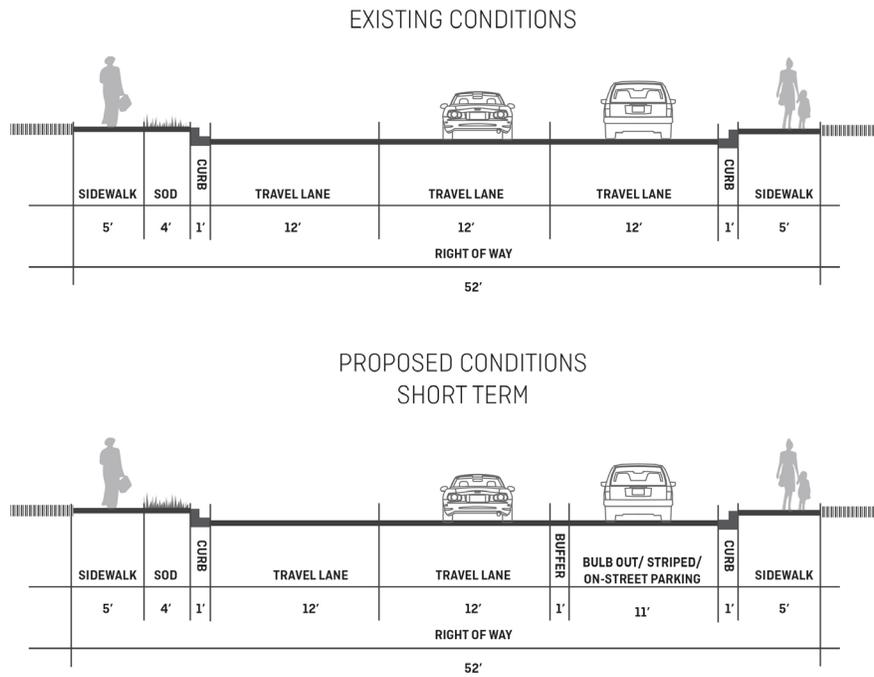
King Street at Brevard Avenue (East Bound)
